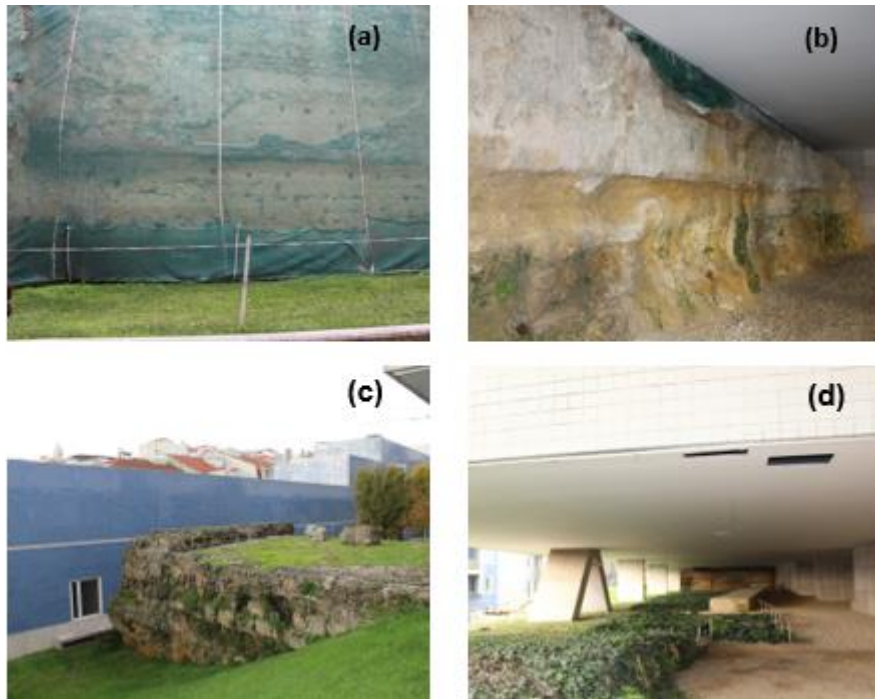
Fernandina Wall in Bragança Terraces Residence: (a) rammed earth wall section facing West showing the holes of the originally used formwork; (b) rammed earth wall section exposed to south but presently under a building; (c) part of the tower with stone masonry; (d) remains of an old Wall section and its replica
